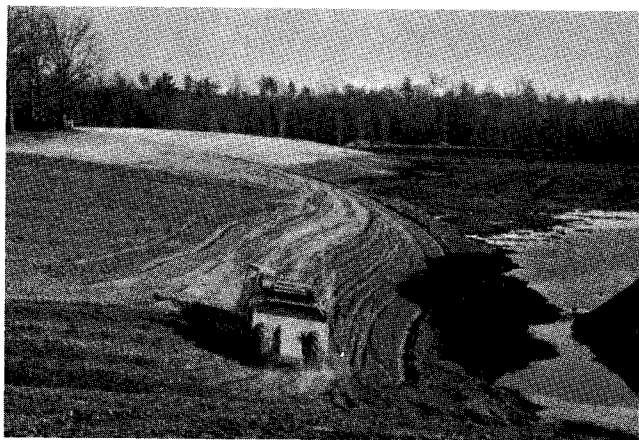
Topsoil being placed on sloped banks of extraction site shown in Figure 6. Area below topsoiled slope will be filled with water to create a small lake. (Photograph courtesy of the Virginia Association of Crushed Stone, Gravel, and Sand Producers, Inc.)
